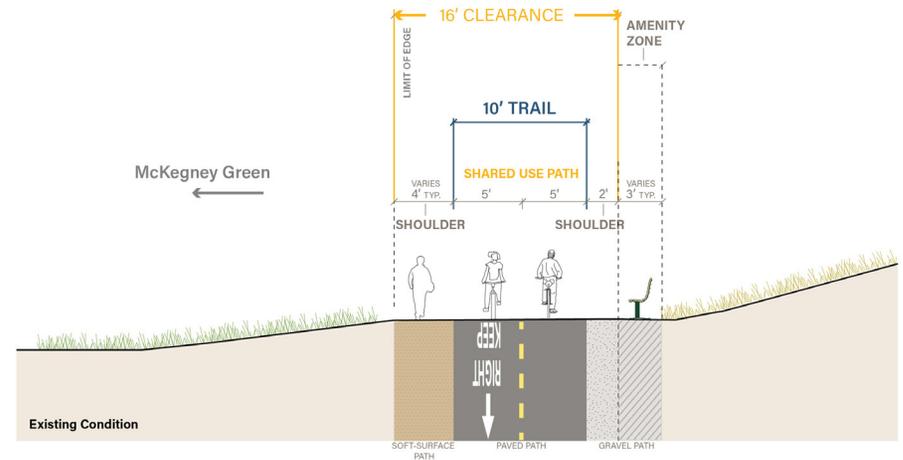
SHORELINE PATH SECTION: EXISTING CONDITION
